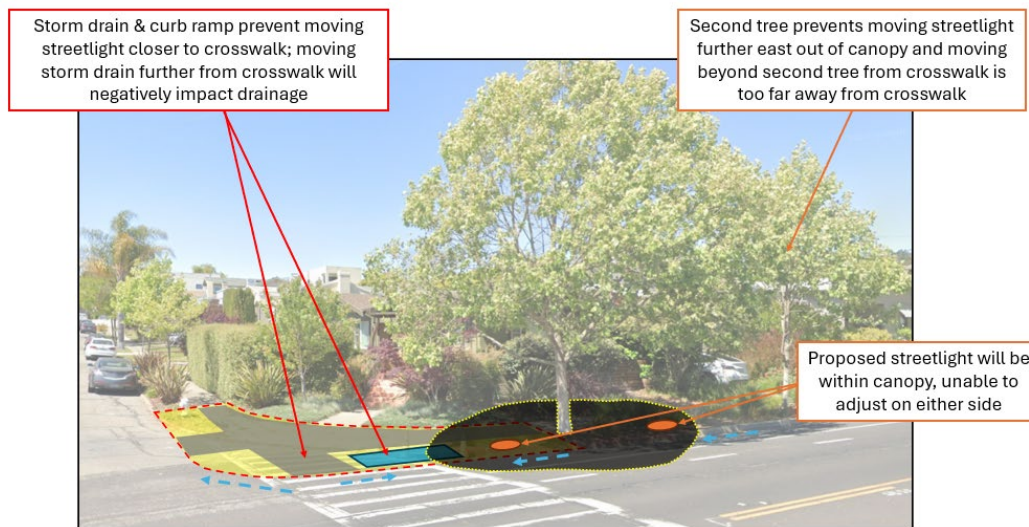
NW Corner of Marin/Neilson at East Leg Crossing; – SLE, Existing Lighting Conditions)
